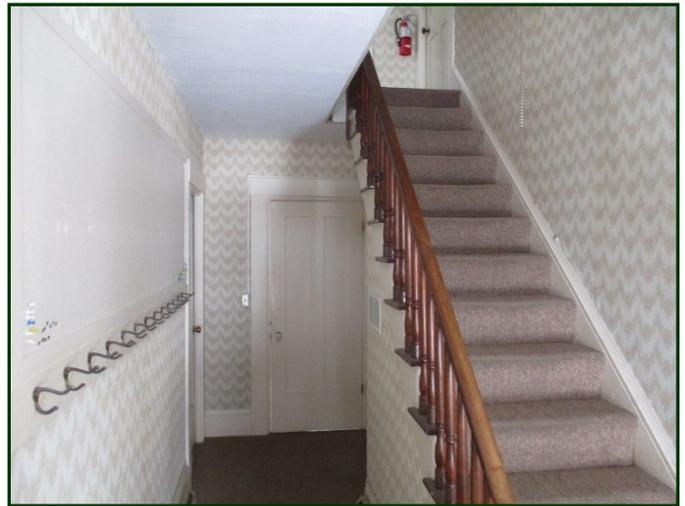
Wooden staircase with carpet and stained wood handrail and balusters (first to second floor level)
